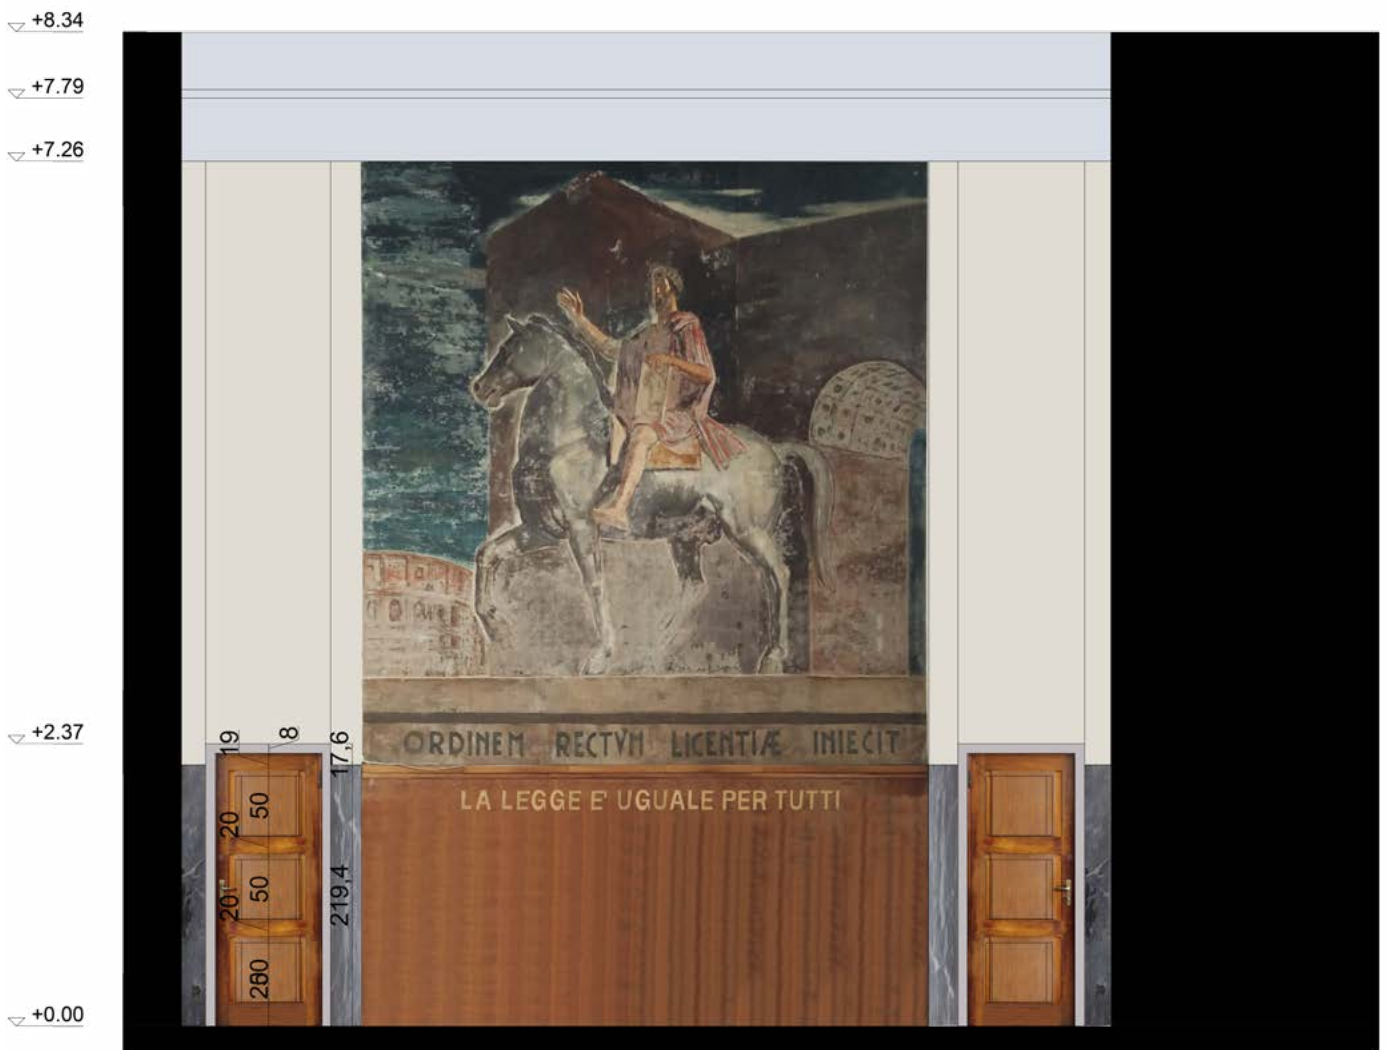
Stefanini Room Section DD - East wall.
